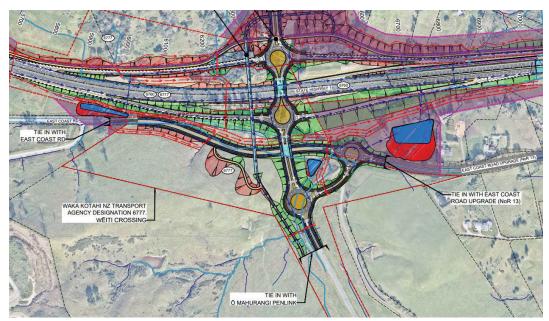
Extract from NoR 4 General Arrangement Plans, showing the extent of works proposed adjacent to WGL's landholdings (at the bottom of the image)
